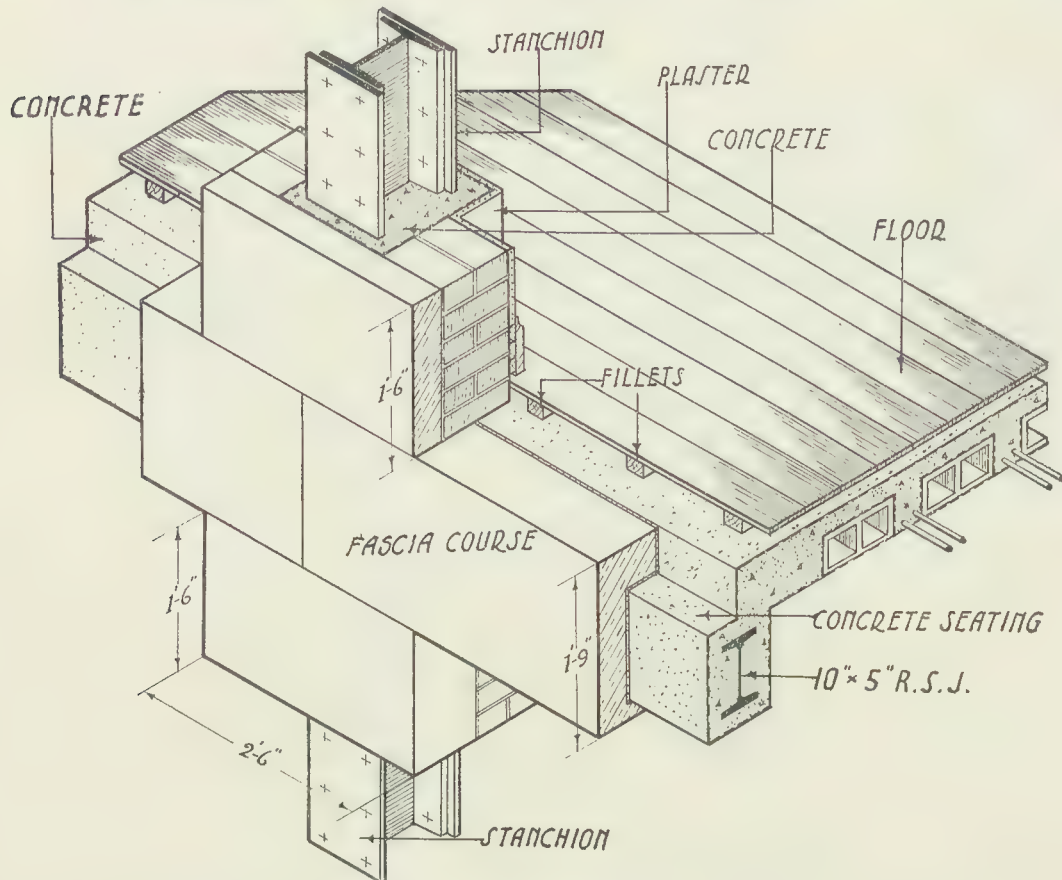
STONE FASCIA COURSE SUPPORTED UPON THE CONCRETE CASING TO THE STRUCTURAL STEELWORK
